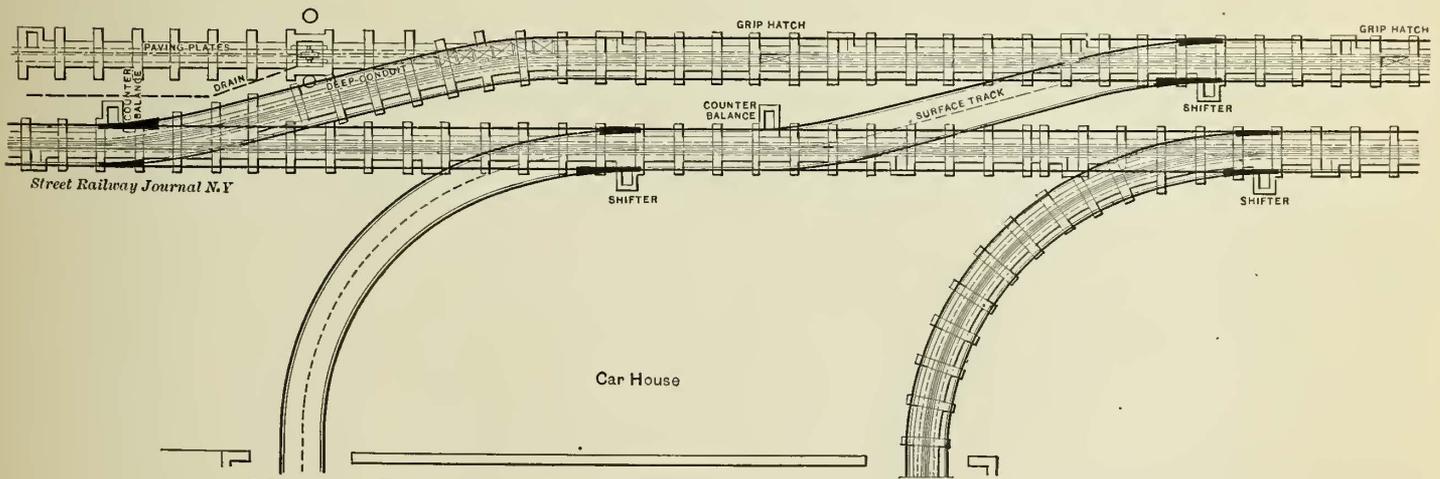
SWITCH AT WEST TERMINAL—WASHINGTON & GEORGETOWN RAILWAY CO.
